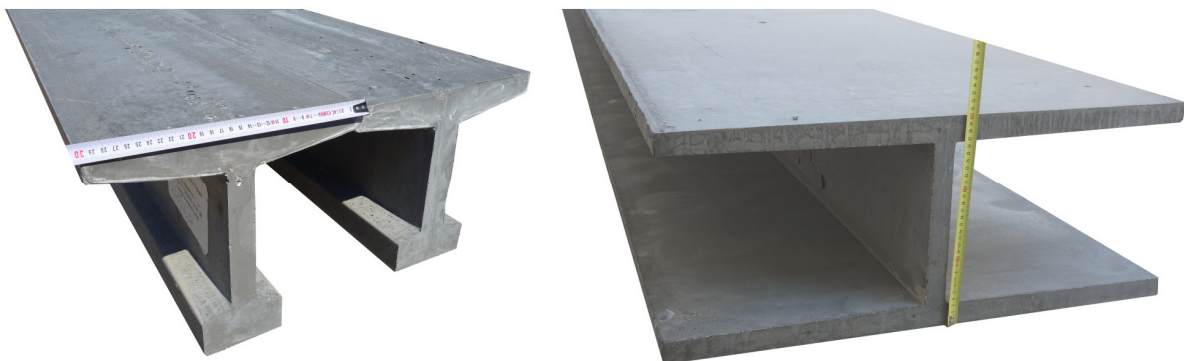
CFRP reinforced T-beam (left) and slab-element (right)
